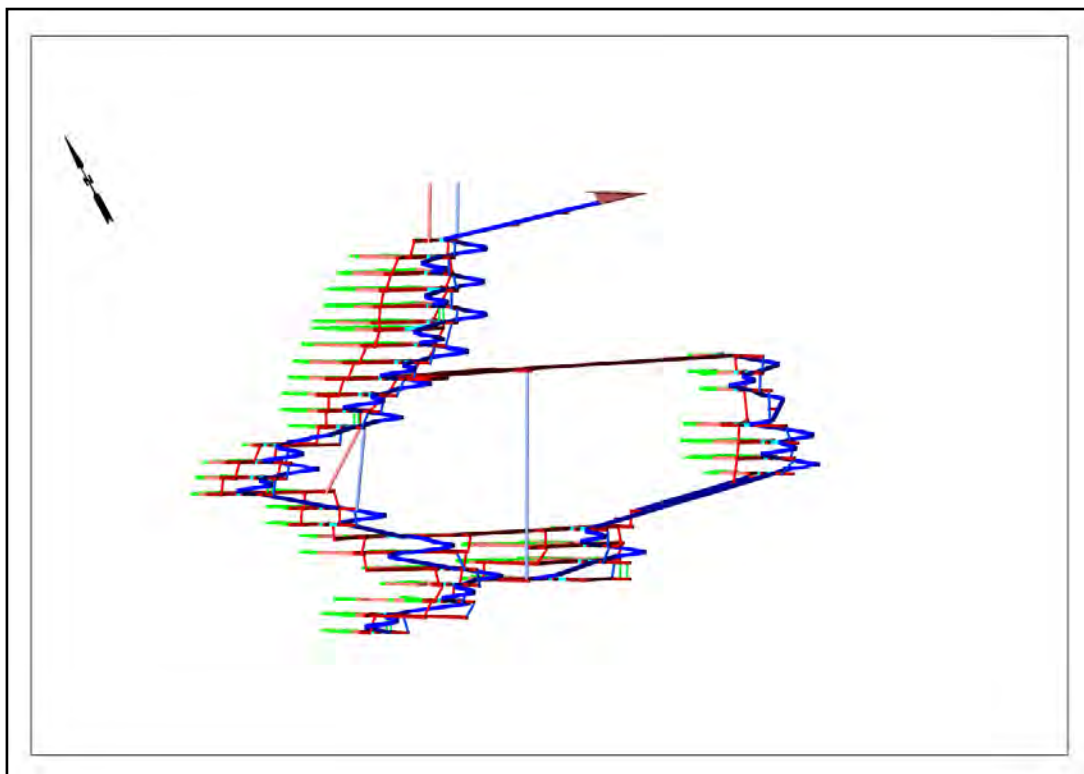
Isometric View of Development Layout Looking Northeast.
